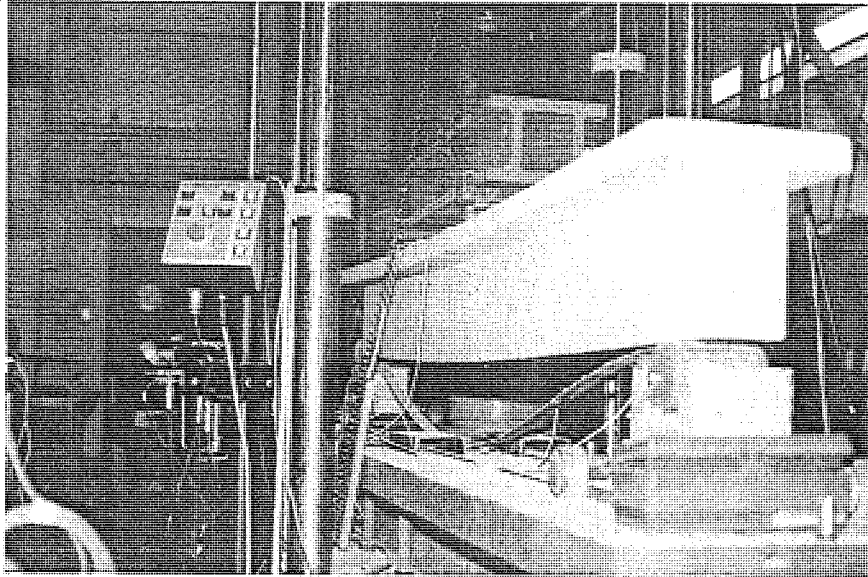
Interfacial shear failure (delamination) of concrete in Beam No.8
